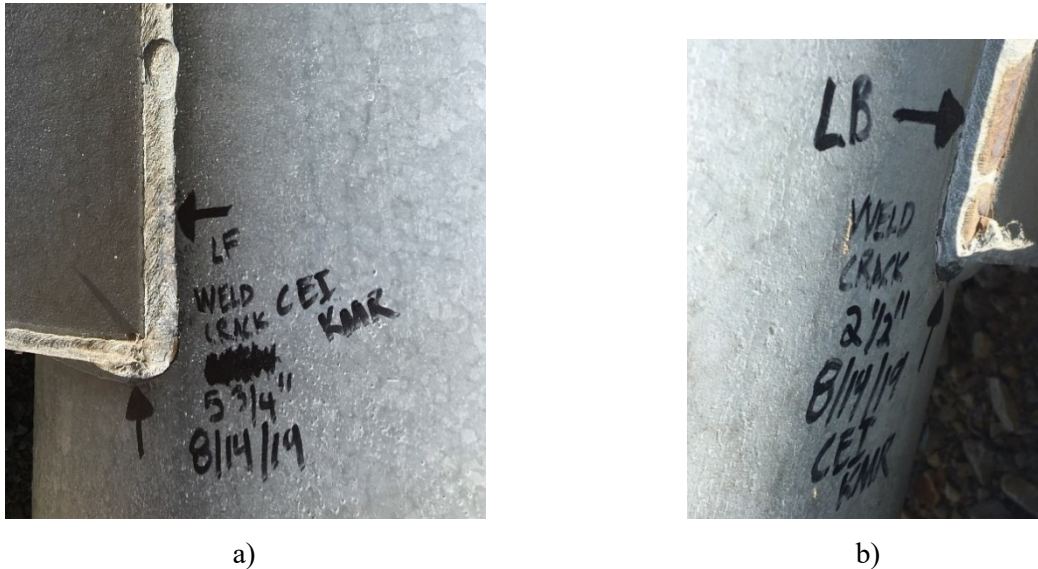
Cracking on Structure 309: a) bottom corner of front side of bottom box and b) bottom corner of back side of bottom box (KDOT)
